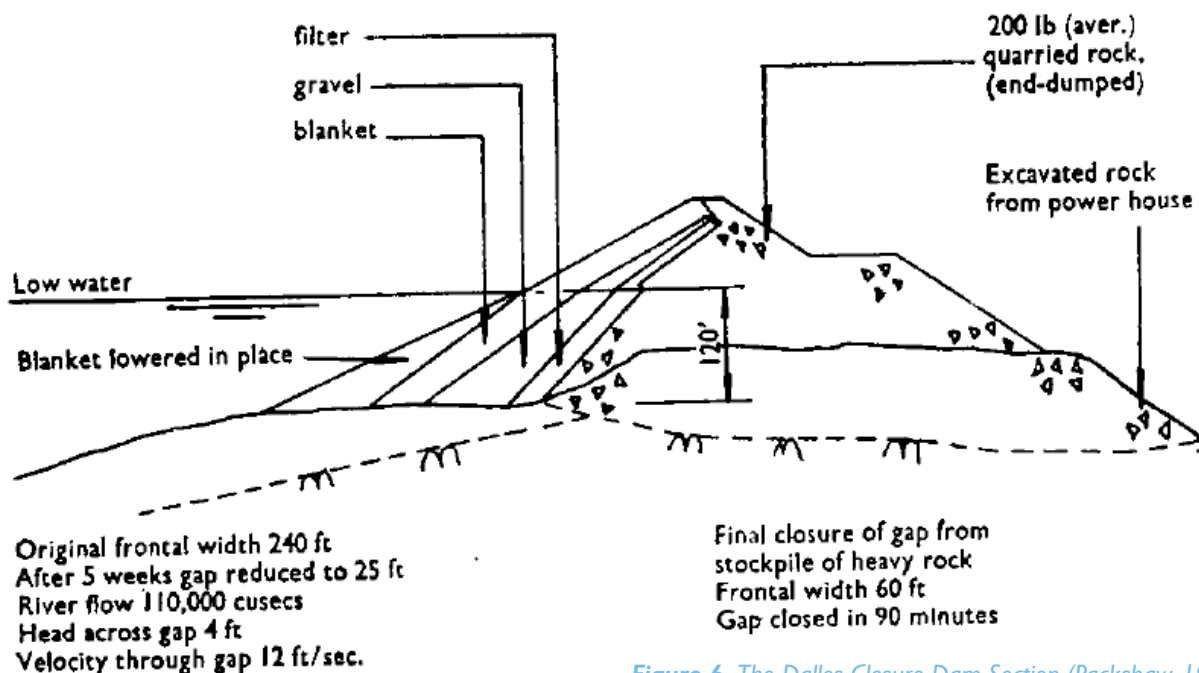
\_The Dalles Closure Dam Section (Packshaw, 1963)
